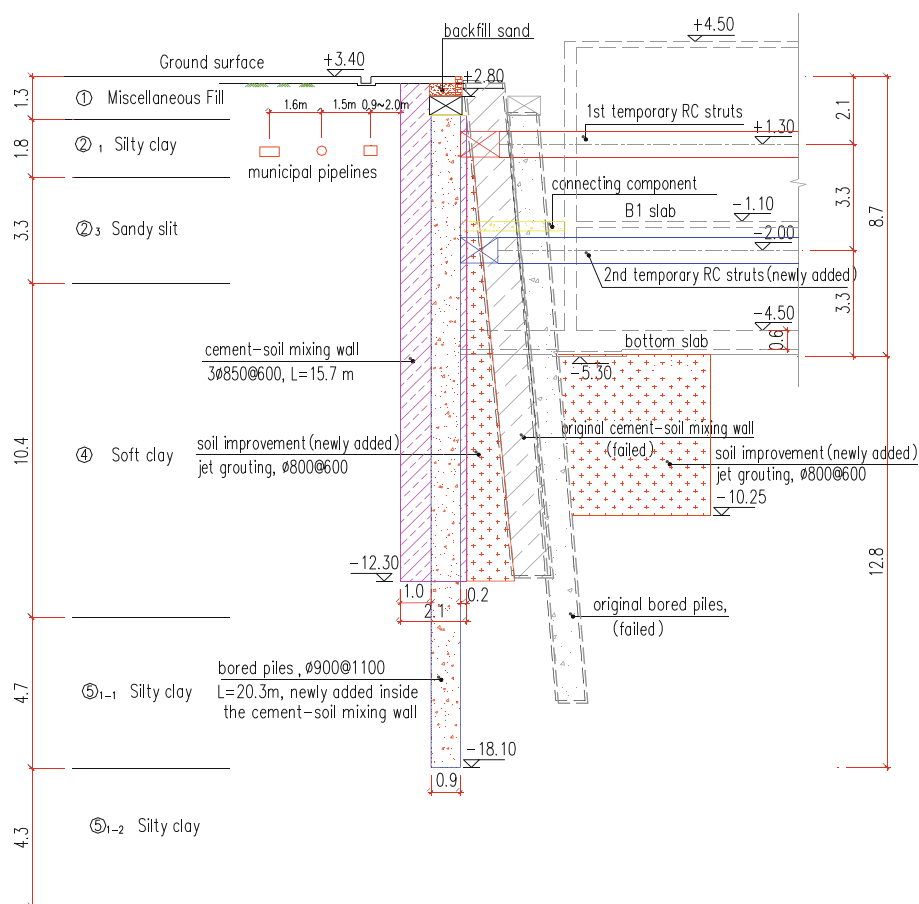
Typical mitigation measures of retaining structures at the failed zone (Mitigation measure B)
